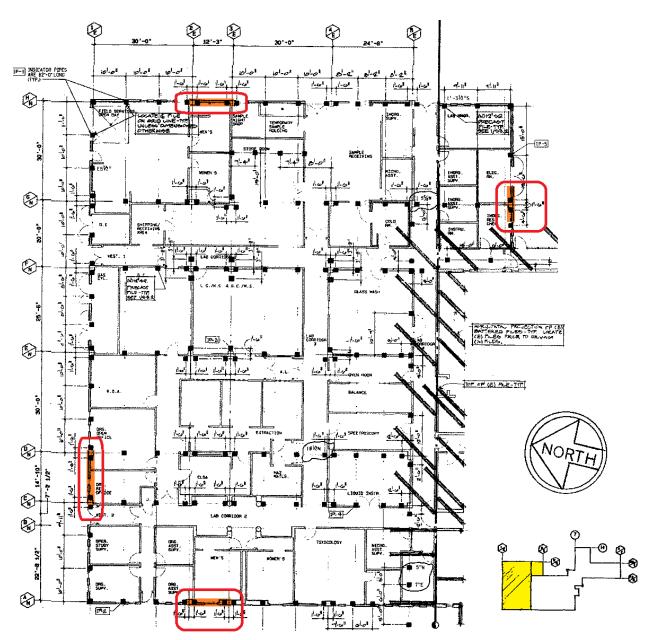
North Lab Addition – Pile Layout Plan Showing the New Shear Walls
